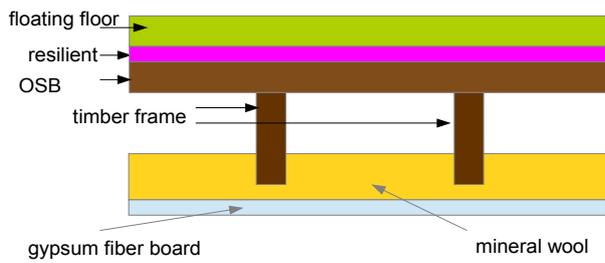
Usual floor construction to meet the NBN S01-400-1 requirements
